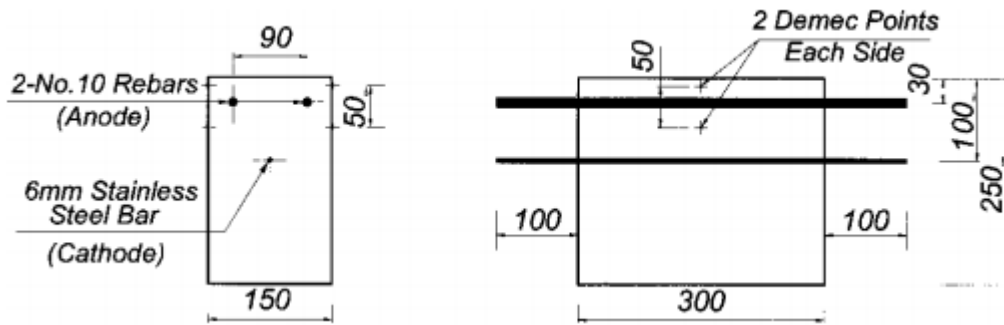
El Maaddawy & Soudkis' experiment specimen
